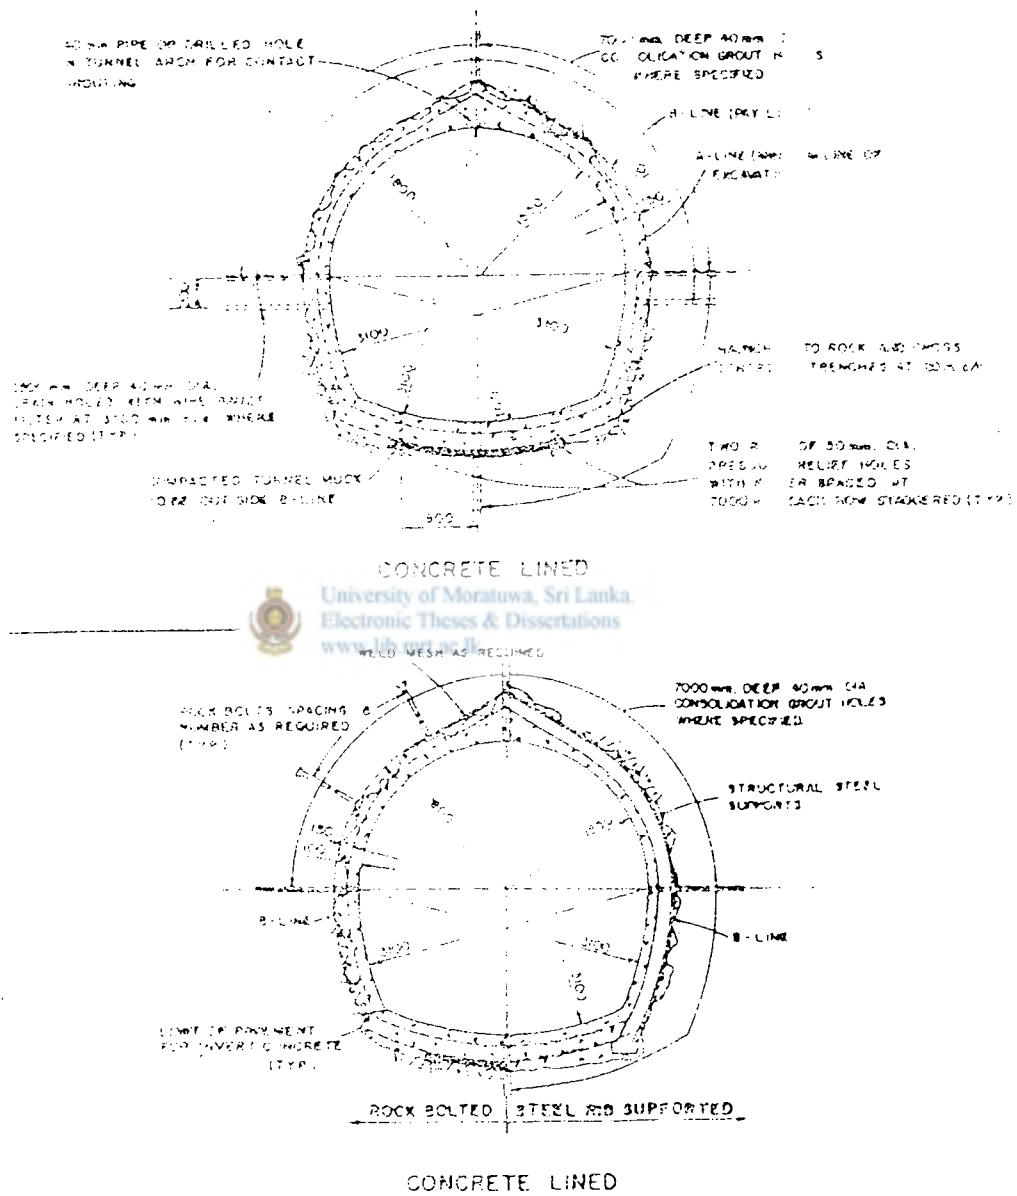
Tunnel Section After Introduction of Concrete Liner
